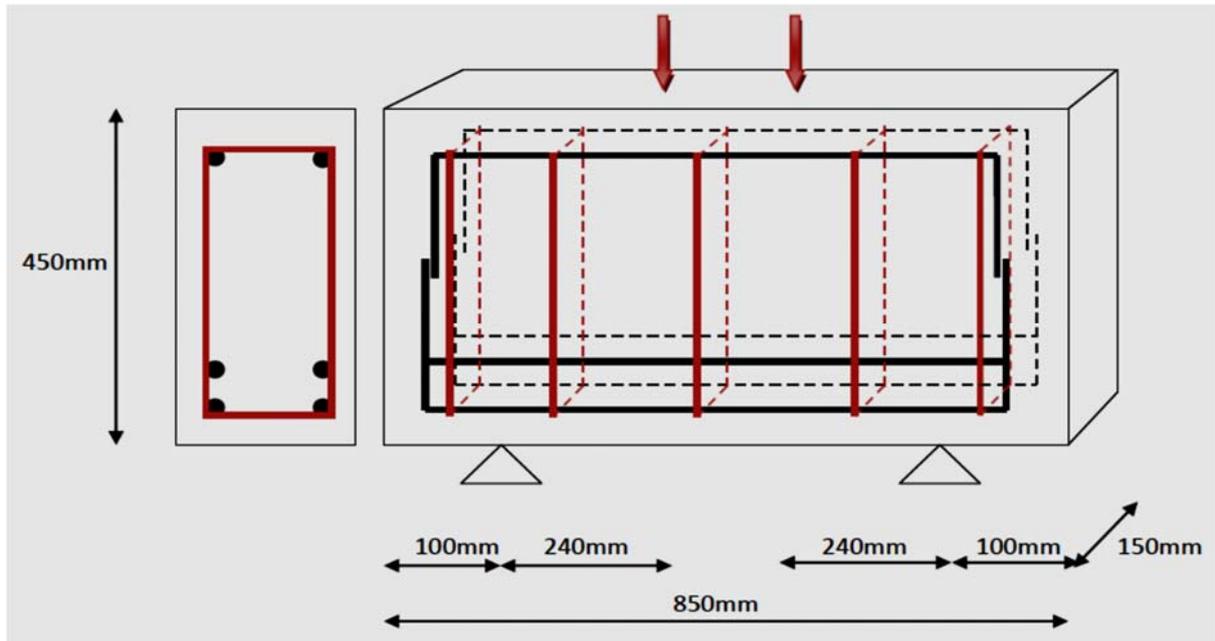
Deep beam section details being modeled as CC and ECC of M40 grade.
